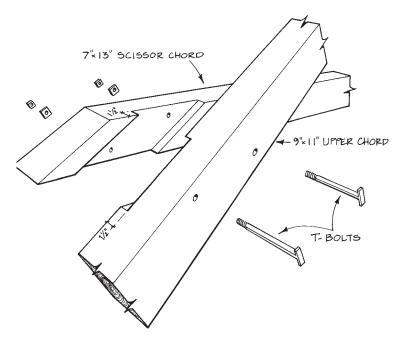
CONNECTION AT UPPER END OF SCISSOR CHORD, ST. PAUL'S.
